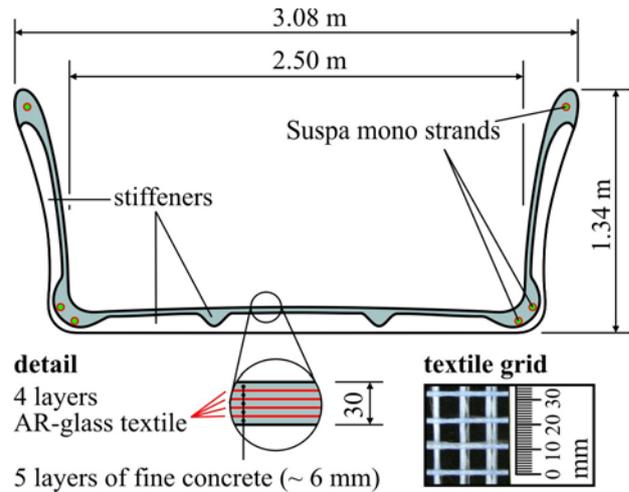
Cross-section of the TRC bridge in Oschatz/Saxony [graphic: Silke Scheerer, TU Dresden]
